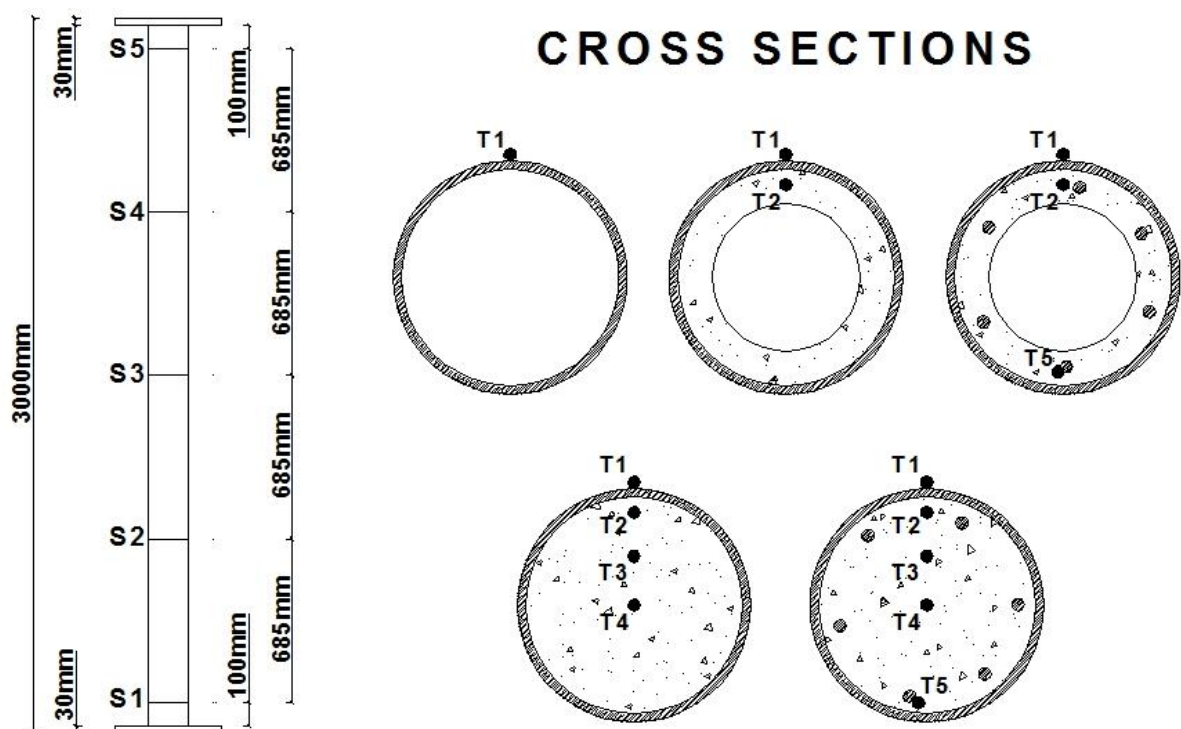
Position of thermocouples on the columns by height and cross-section
